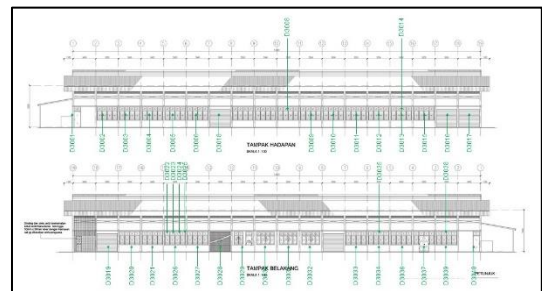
Elevation drawing with defect tagging of windows and doors opening dilapidation in Block D SMPKVSA.
